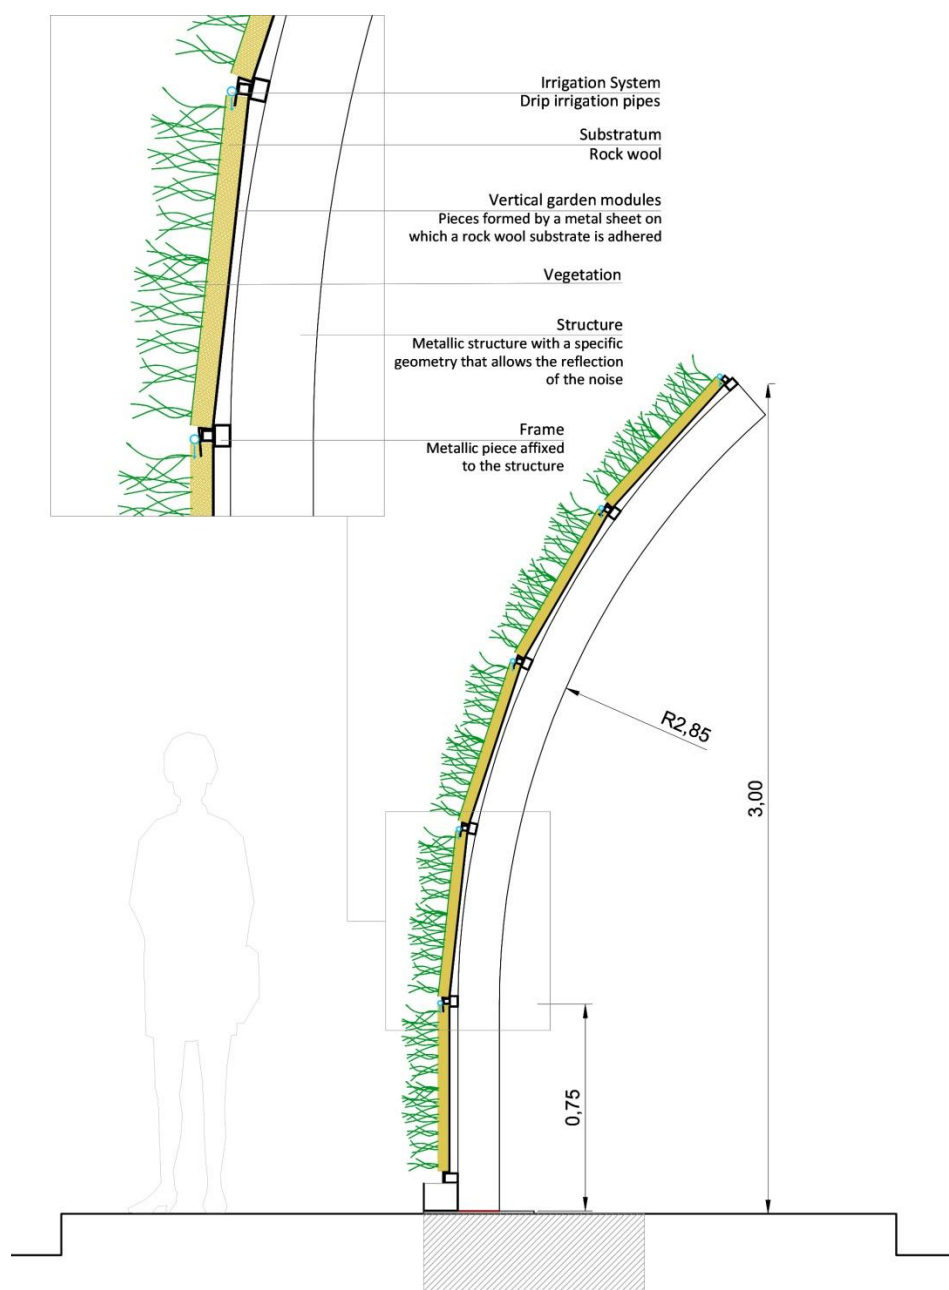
Constructive section of the Green Noise Barriers (Source: SingularGreen)
